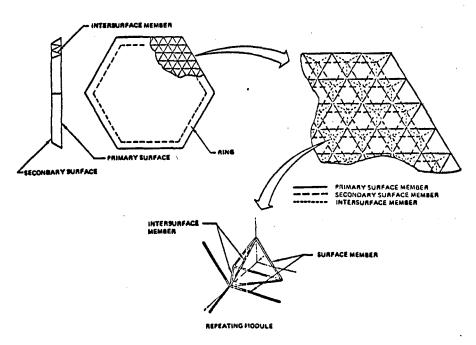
PLATE STRUCTURE UTILIZING TETRAHEDRAL TRUSS
